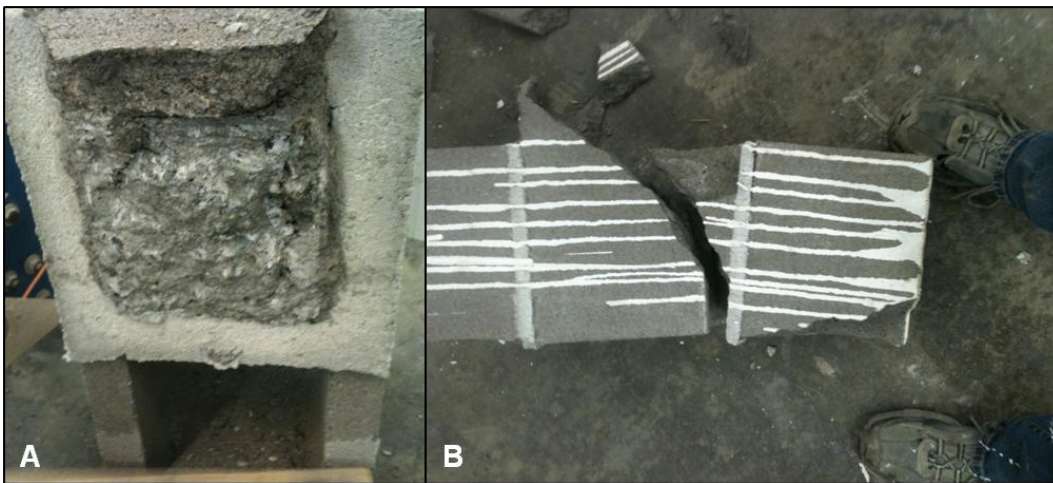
Failure of grouted triplet (a) while still on the testing platform and (b) removed from the testing machine
